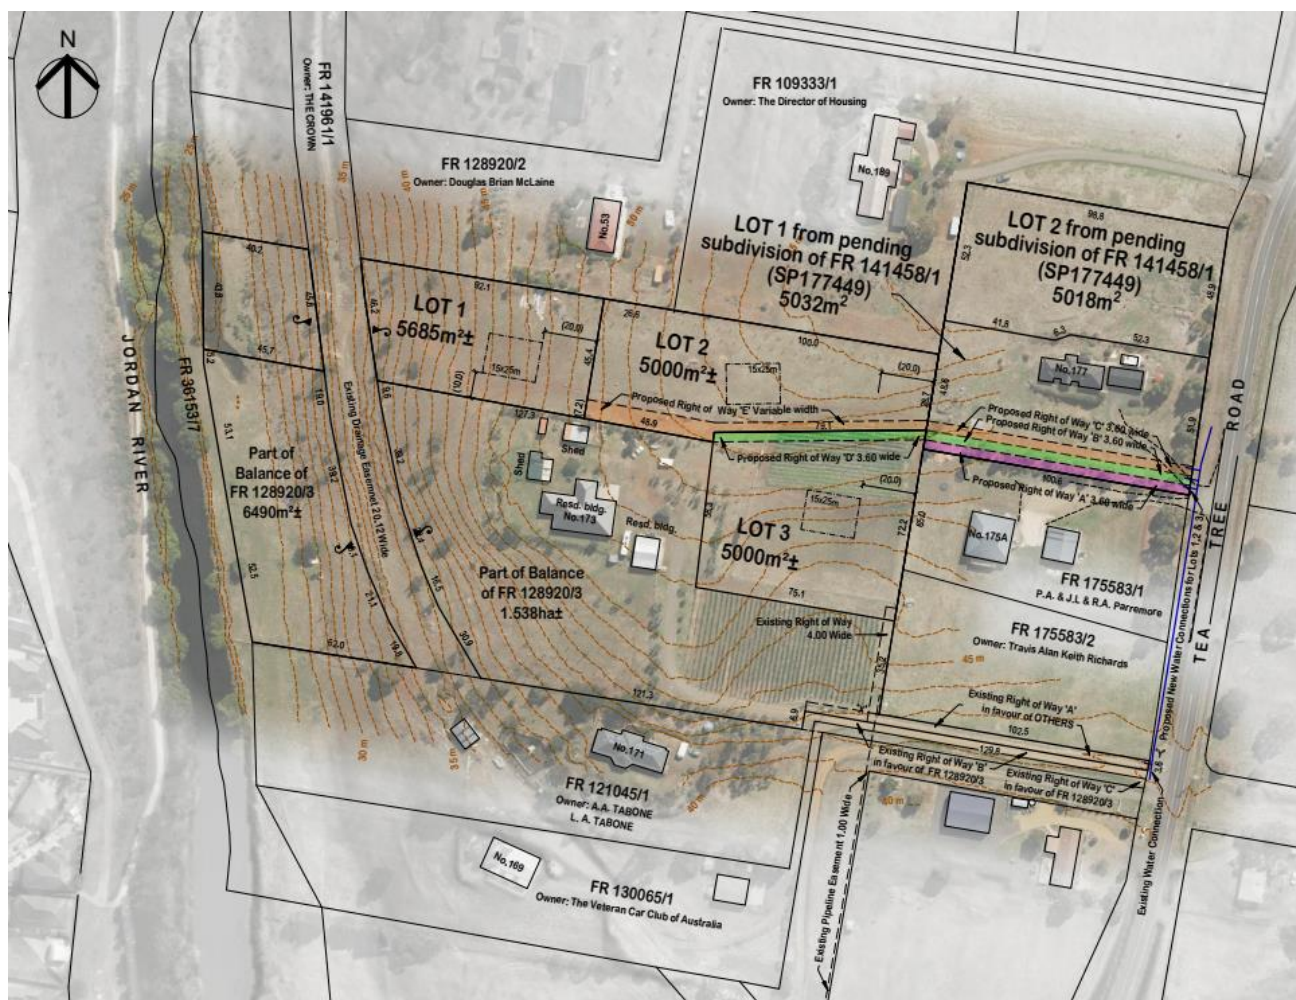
Proposed Plan of Subdivision: PDA-48574CT-1E
